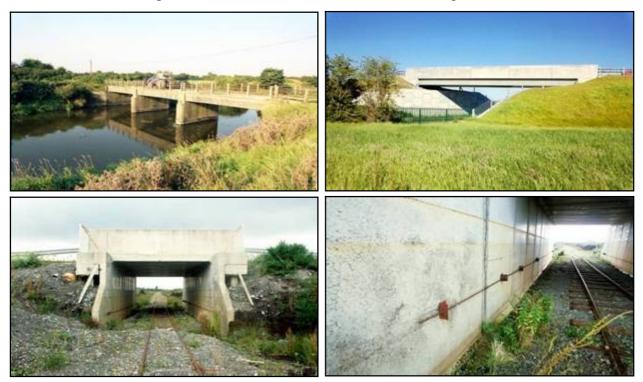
(*top left*): Kilcolgan Bridge, a beam and slab structure of c.1951 over Brosna (015-006). Fig 2.18b (*top right*): Pre-cast beam and slab bridge of 2002 over Dublin-Galway railway, Cloncoher Td (025-016). Figs 2.19c and 19d (*bottom*): This pre-cast concrete box-section bridge of 1999 carries the Daingean-Tullamore road over a Bord na Mona railway (018-041). The individual units are tied together with metal rods.
